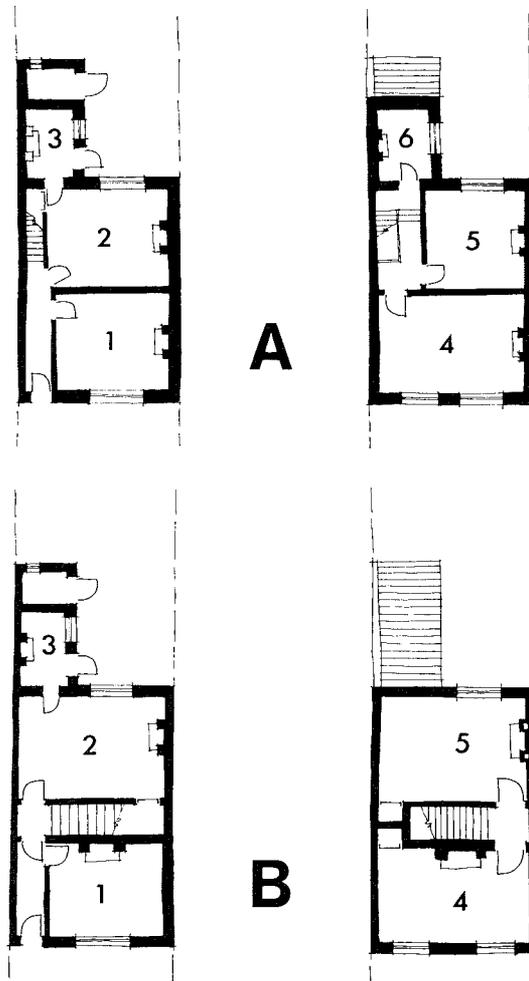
Typical examples of “traditional” working class terraced housing. Type A has staircase on party wall, Type B has central staircase. Ground floor: 1, parlour; 2, living room; 3, scullery. First floor: 4, main bedroom; 5, second bedroom; 6, box room.
